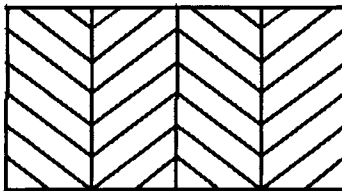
“Point de Hongrie” wooden floor
